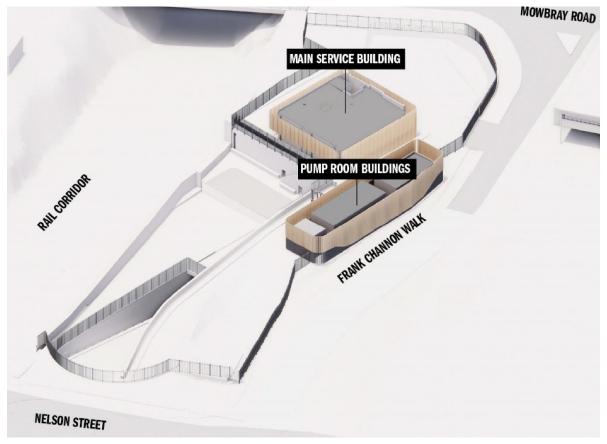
Chatswood Dive – Overall site plan aerial view showing services building and fire pump room and tanks enclosure
